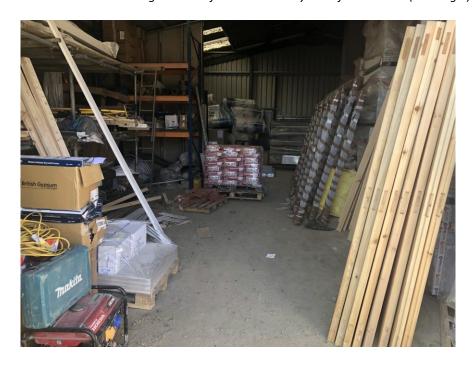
View looking W showing interior of late 20<sup>th</sup> century steel-framed storage shed (Building 1)
